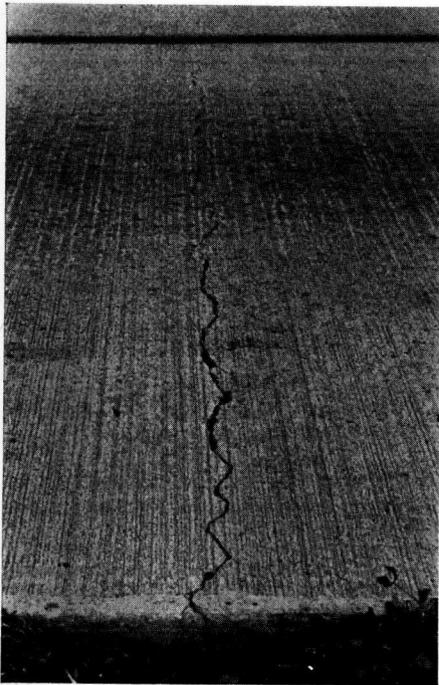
Typical Crack over Submerged Parting Strip in Lane Carrying Heavy Traffic
